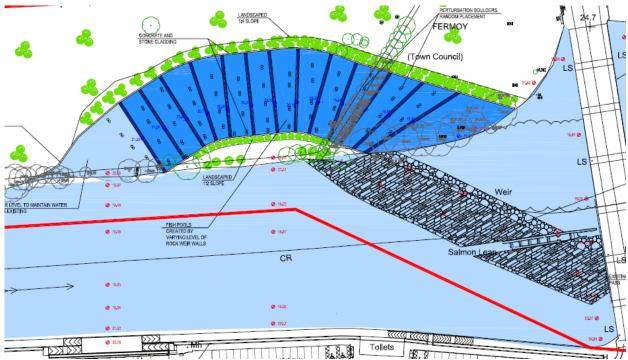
Proposed Fish Pass Plan – extract from drawing no. 19011-TJOC-PL-XX-DR-C-0053
